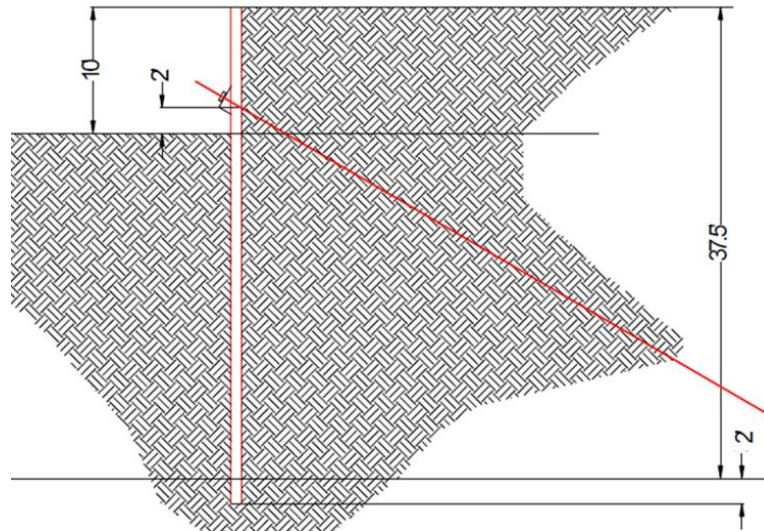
Step 1 of Retention System Design Process (all dimensions in feet)
